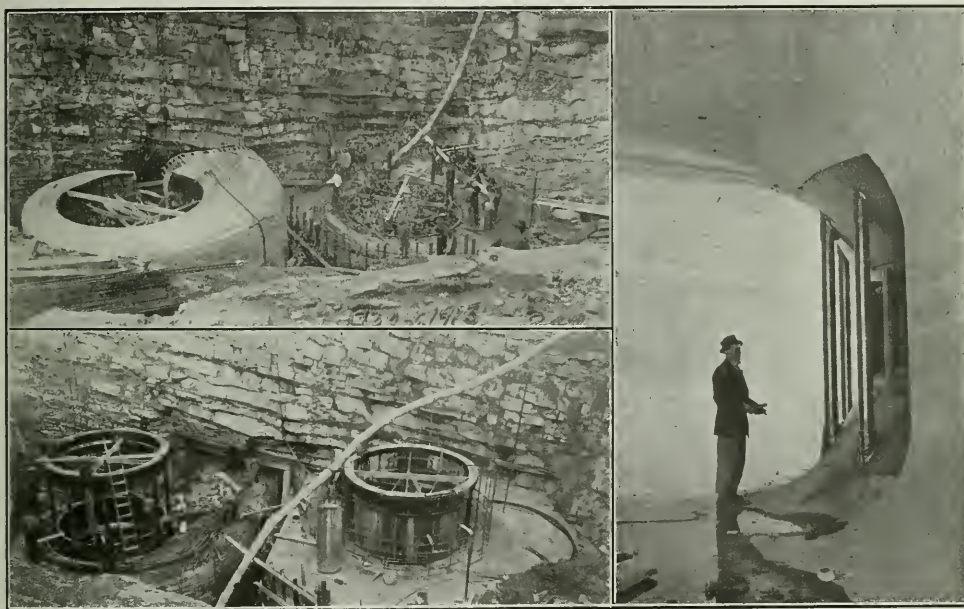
Scroll Chambers During Construction. Also Interior View of One with Forms Removed, Showing Turbine Frame in Place.
